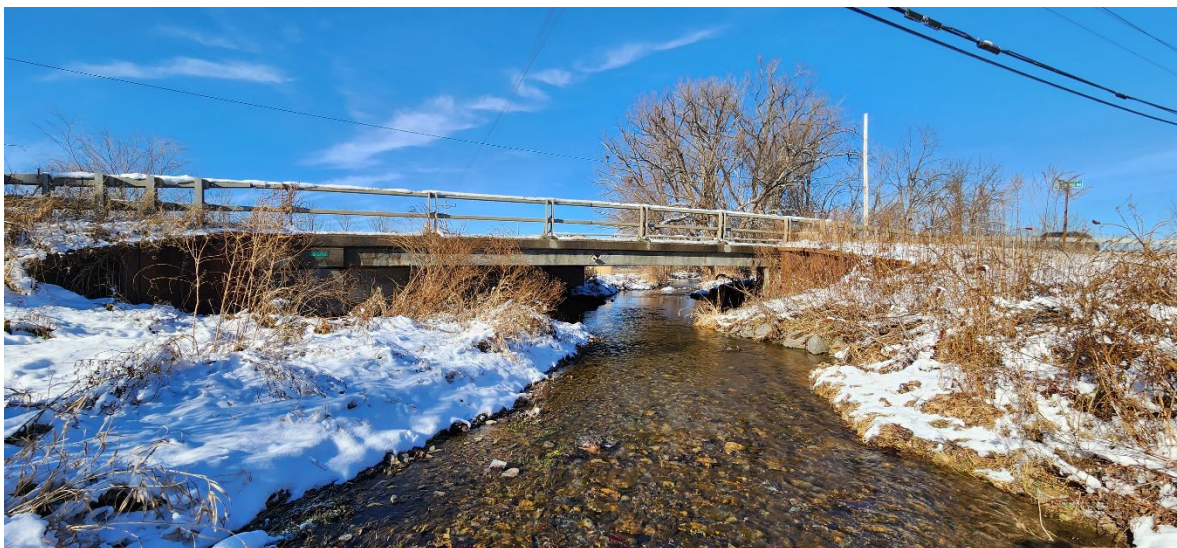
Upstream view of the Kirkland Avenue bridge in the Sherman Brook corridor.
